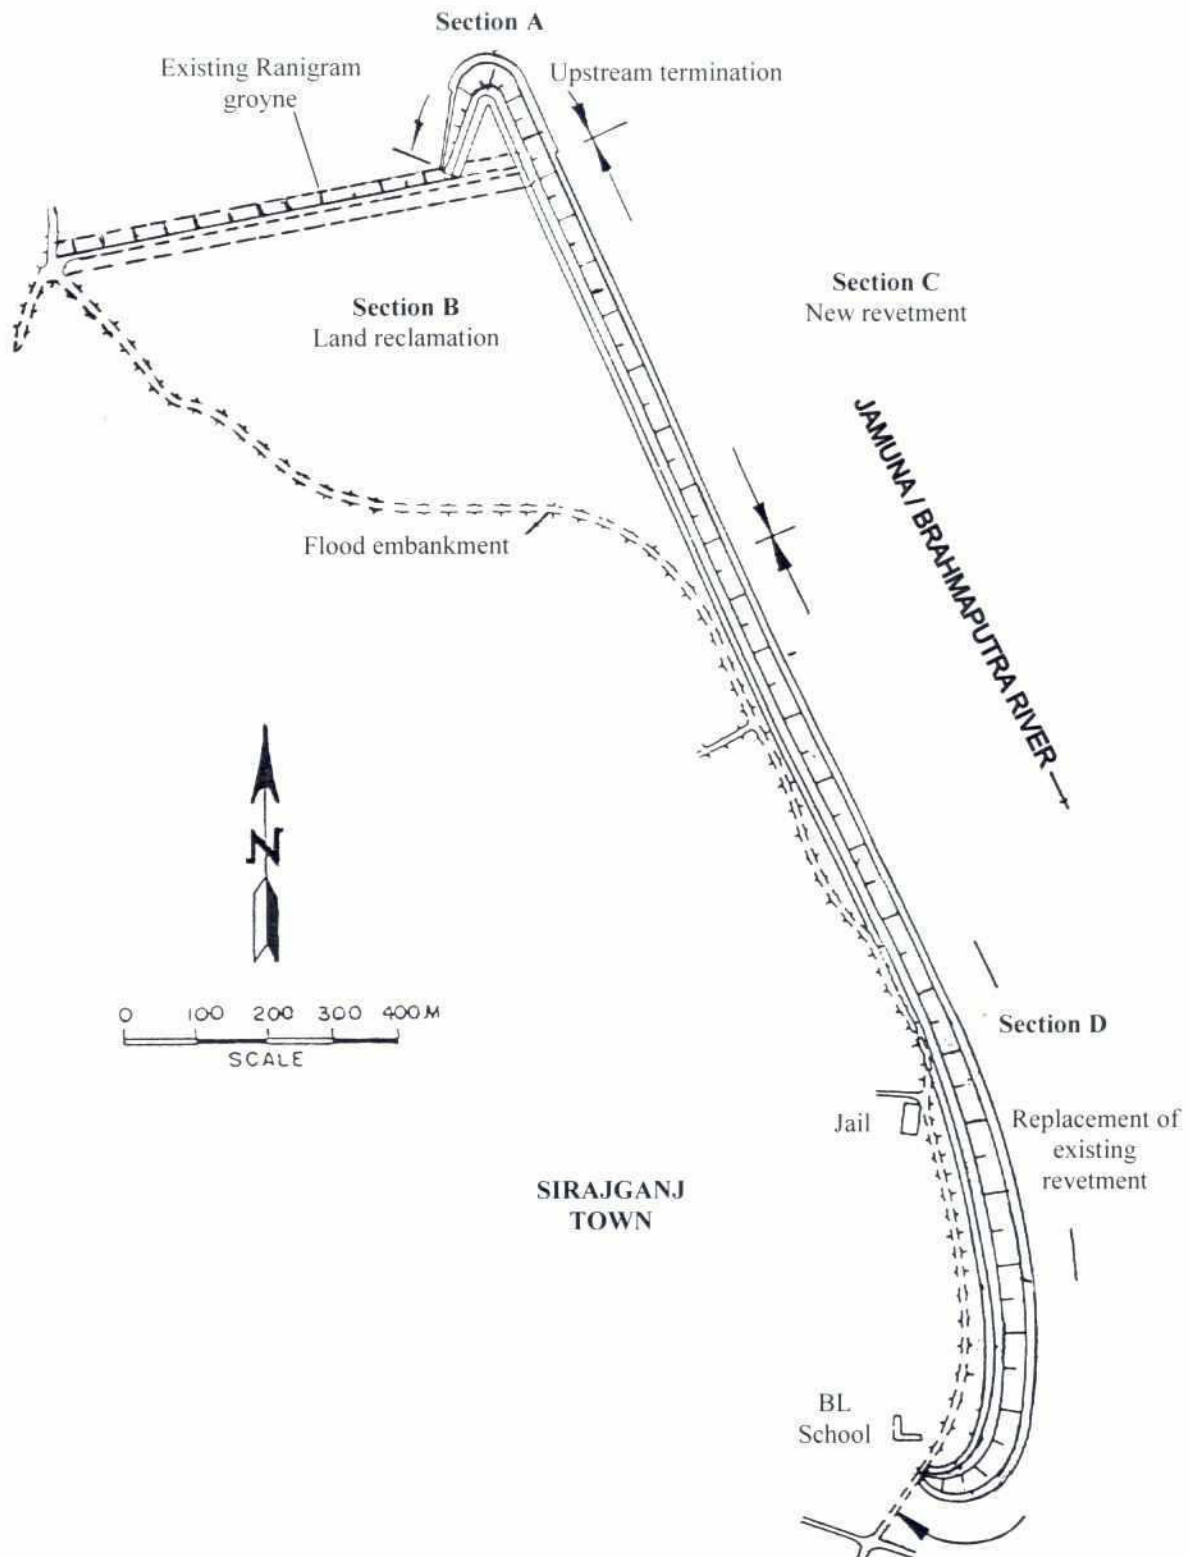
Layout of FAP 1 hard point No. 1 at Sirajganj
